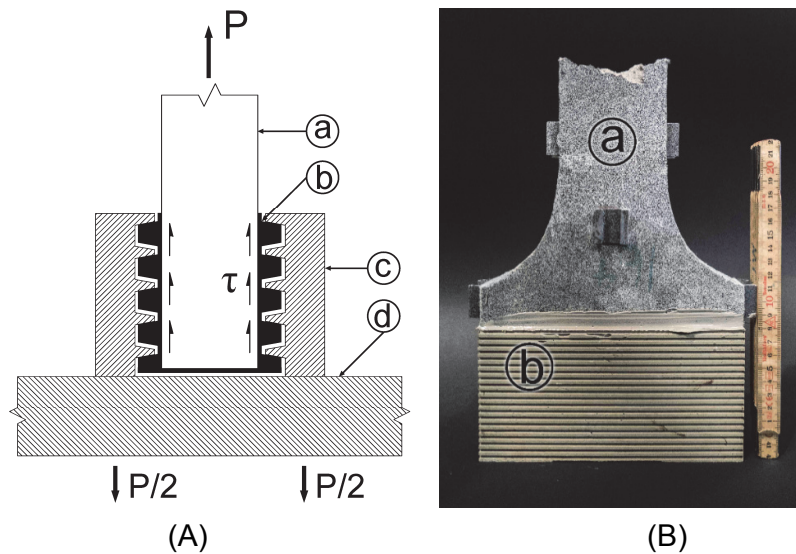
\_ (A) Schematic sketch of the fixture set-up of the uniaxial tensile test (adapted after [71]) and (B) Tensile specimen after testing, with (a) specimen, (b) hardened resin indentations glued to the specimen surface, (c) indented steel plate, and (d) base plate
